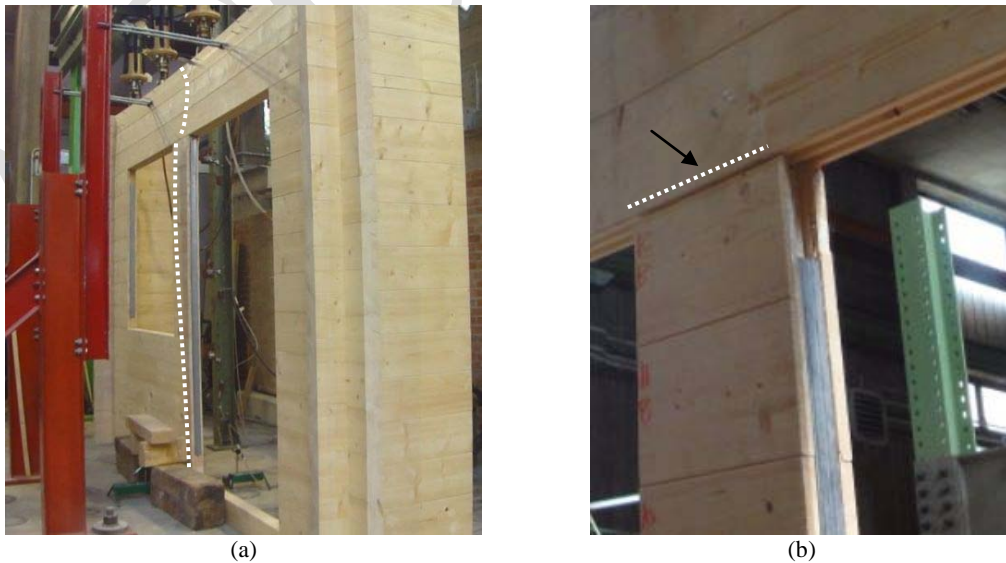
Deformed configuration at N_{max} of specimen W04. (a) Overview and (b) detail at the connection between the central portion of wall and the top logs.
